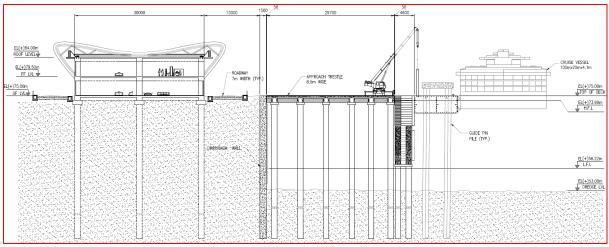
Typical Cross-section of Berthing facility at High Flood level (+) 73.9m CD
